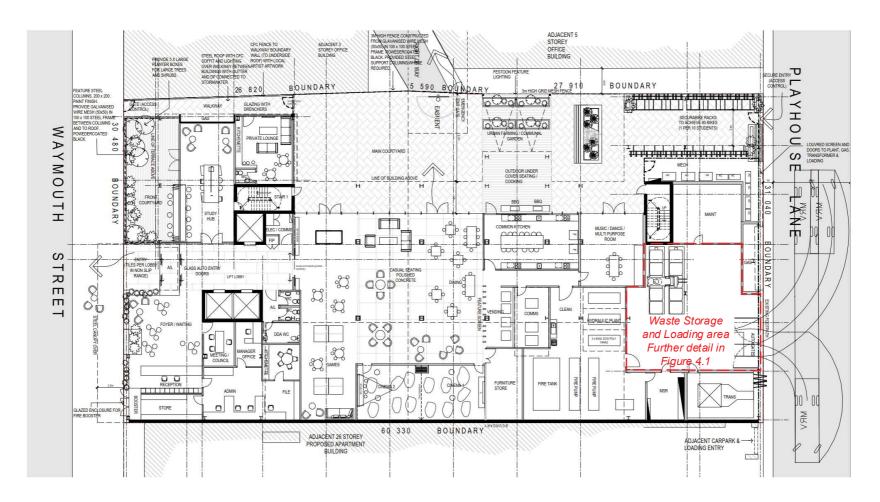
Ground Level plan and site boundary for Development, reproduced from the Drawings.
